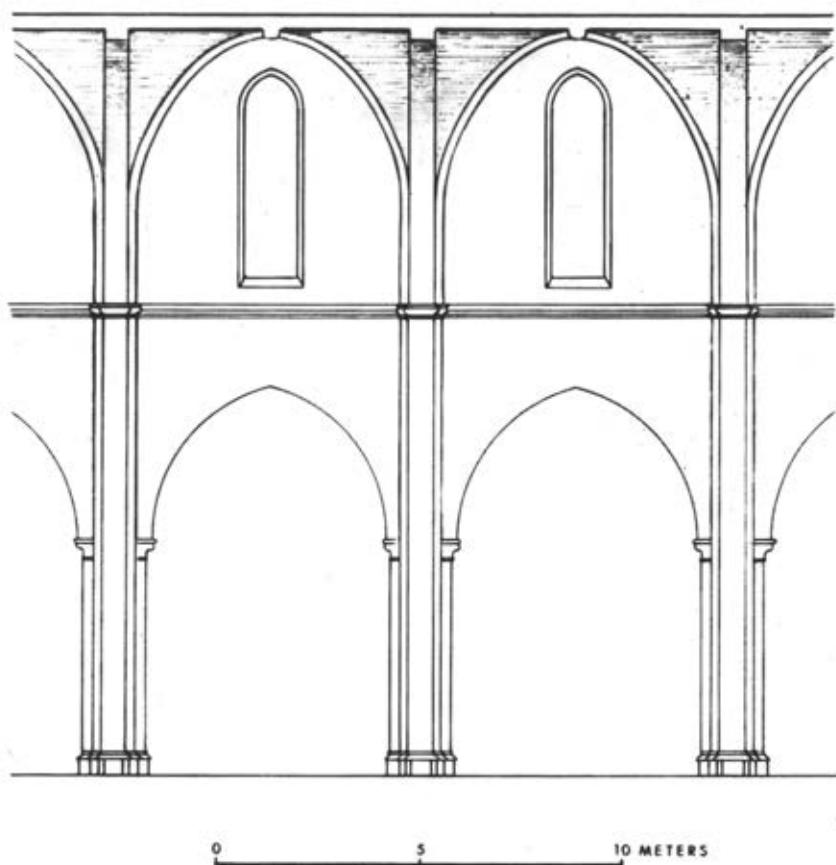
Church of Zaraka. Elevation (projected plan).
